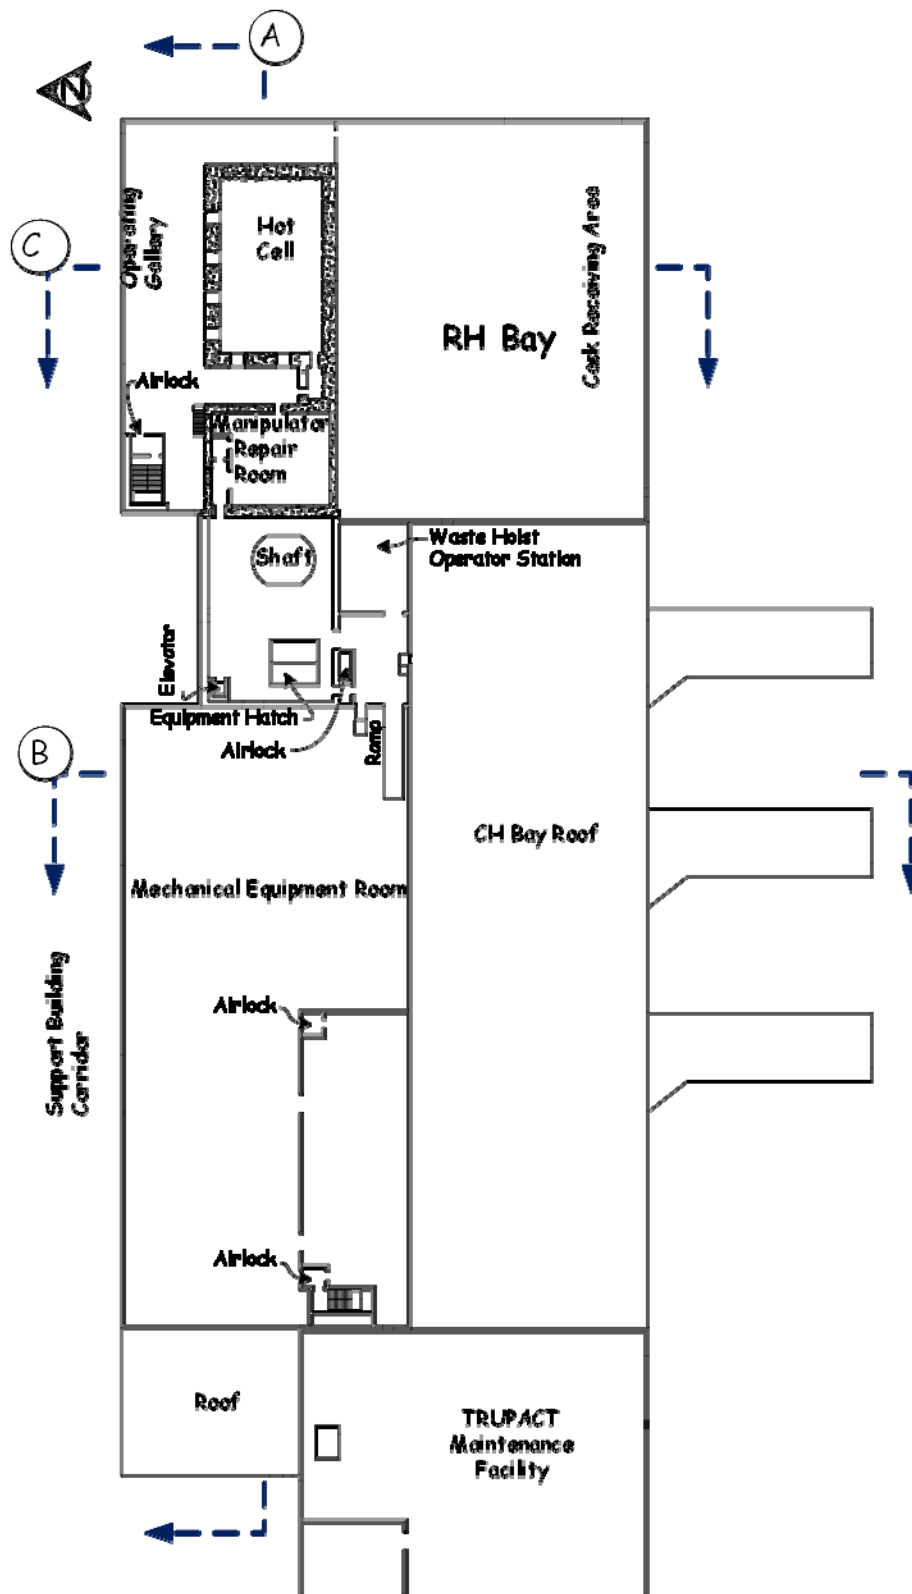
Waste Handling Building Plan (Upper Floor)
